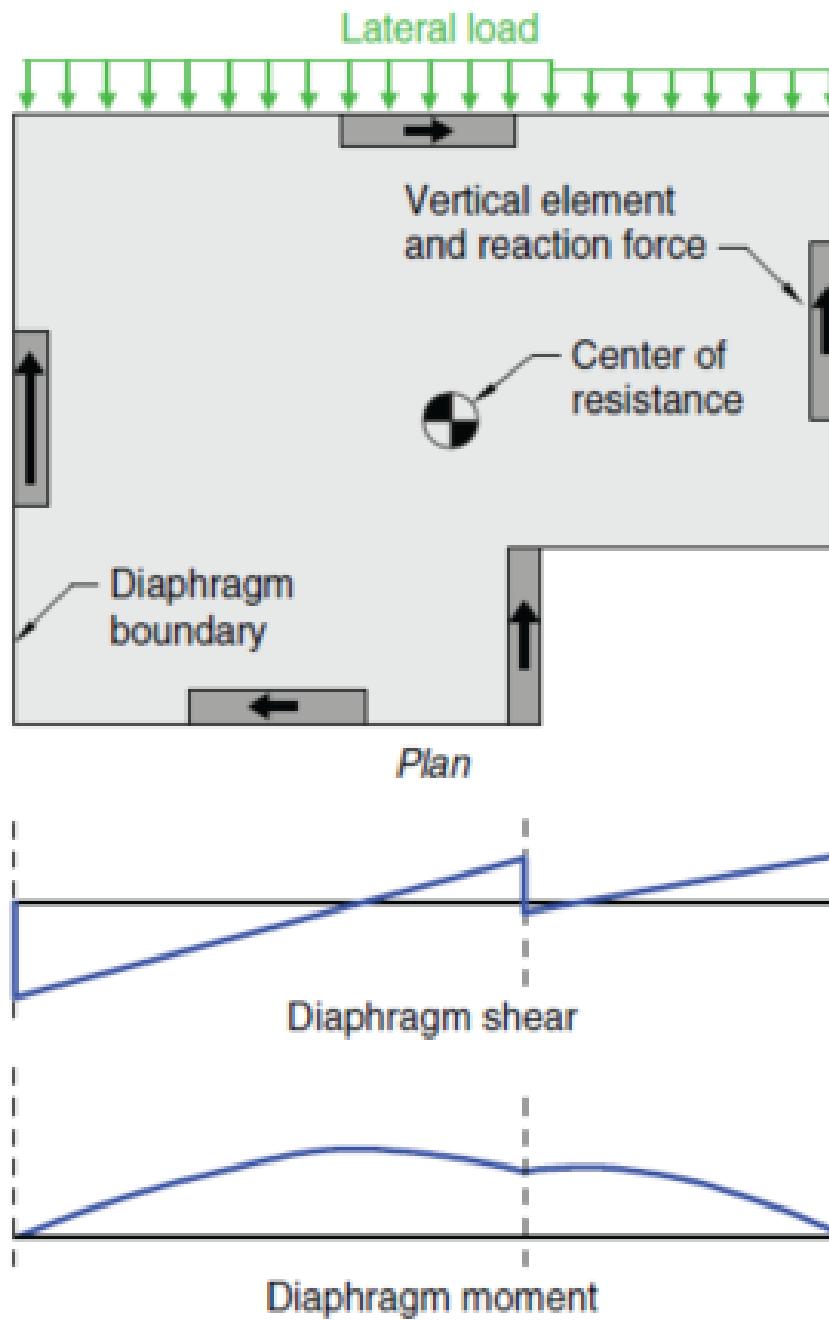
Diaphragm in-plane actions obtained by modeling the diaphragm as a horizontal rigid beam on flexible supports.
